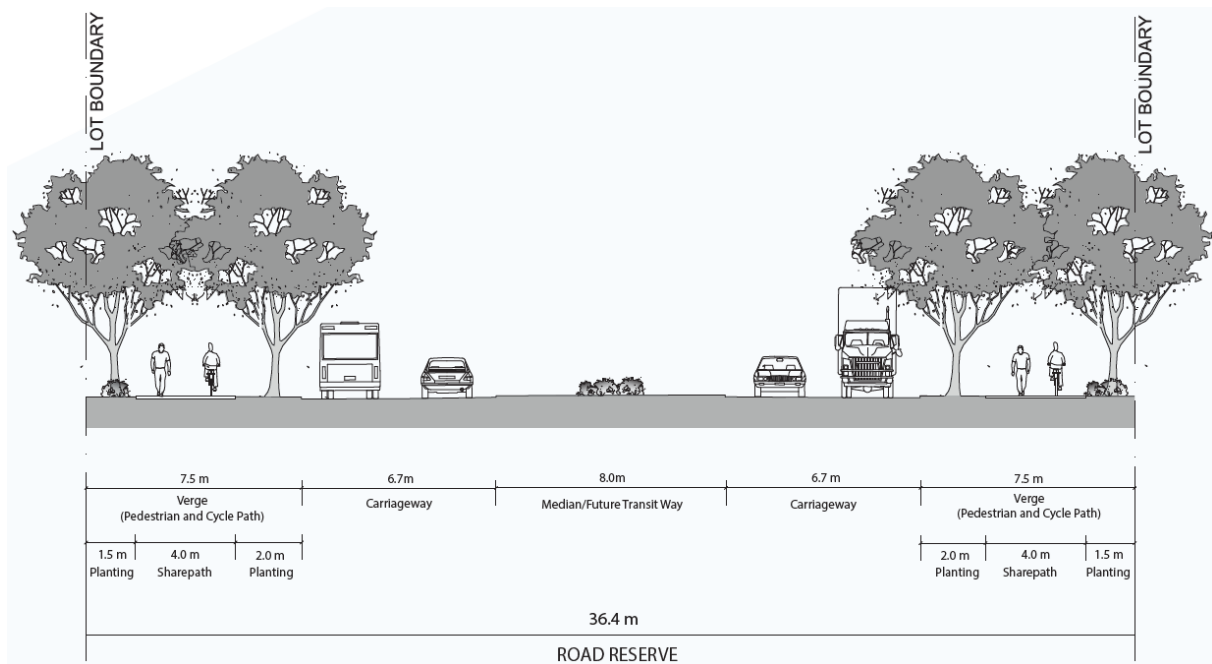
Sub-Arterial Road - cross section (Source: Design + Planning)
